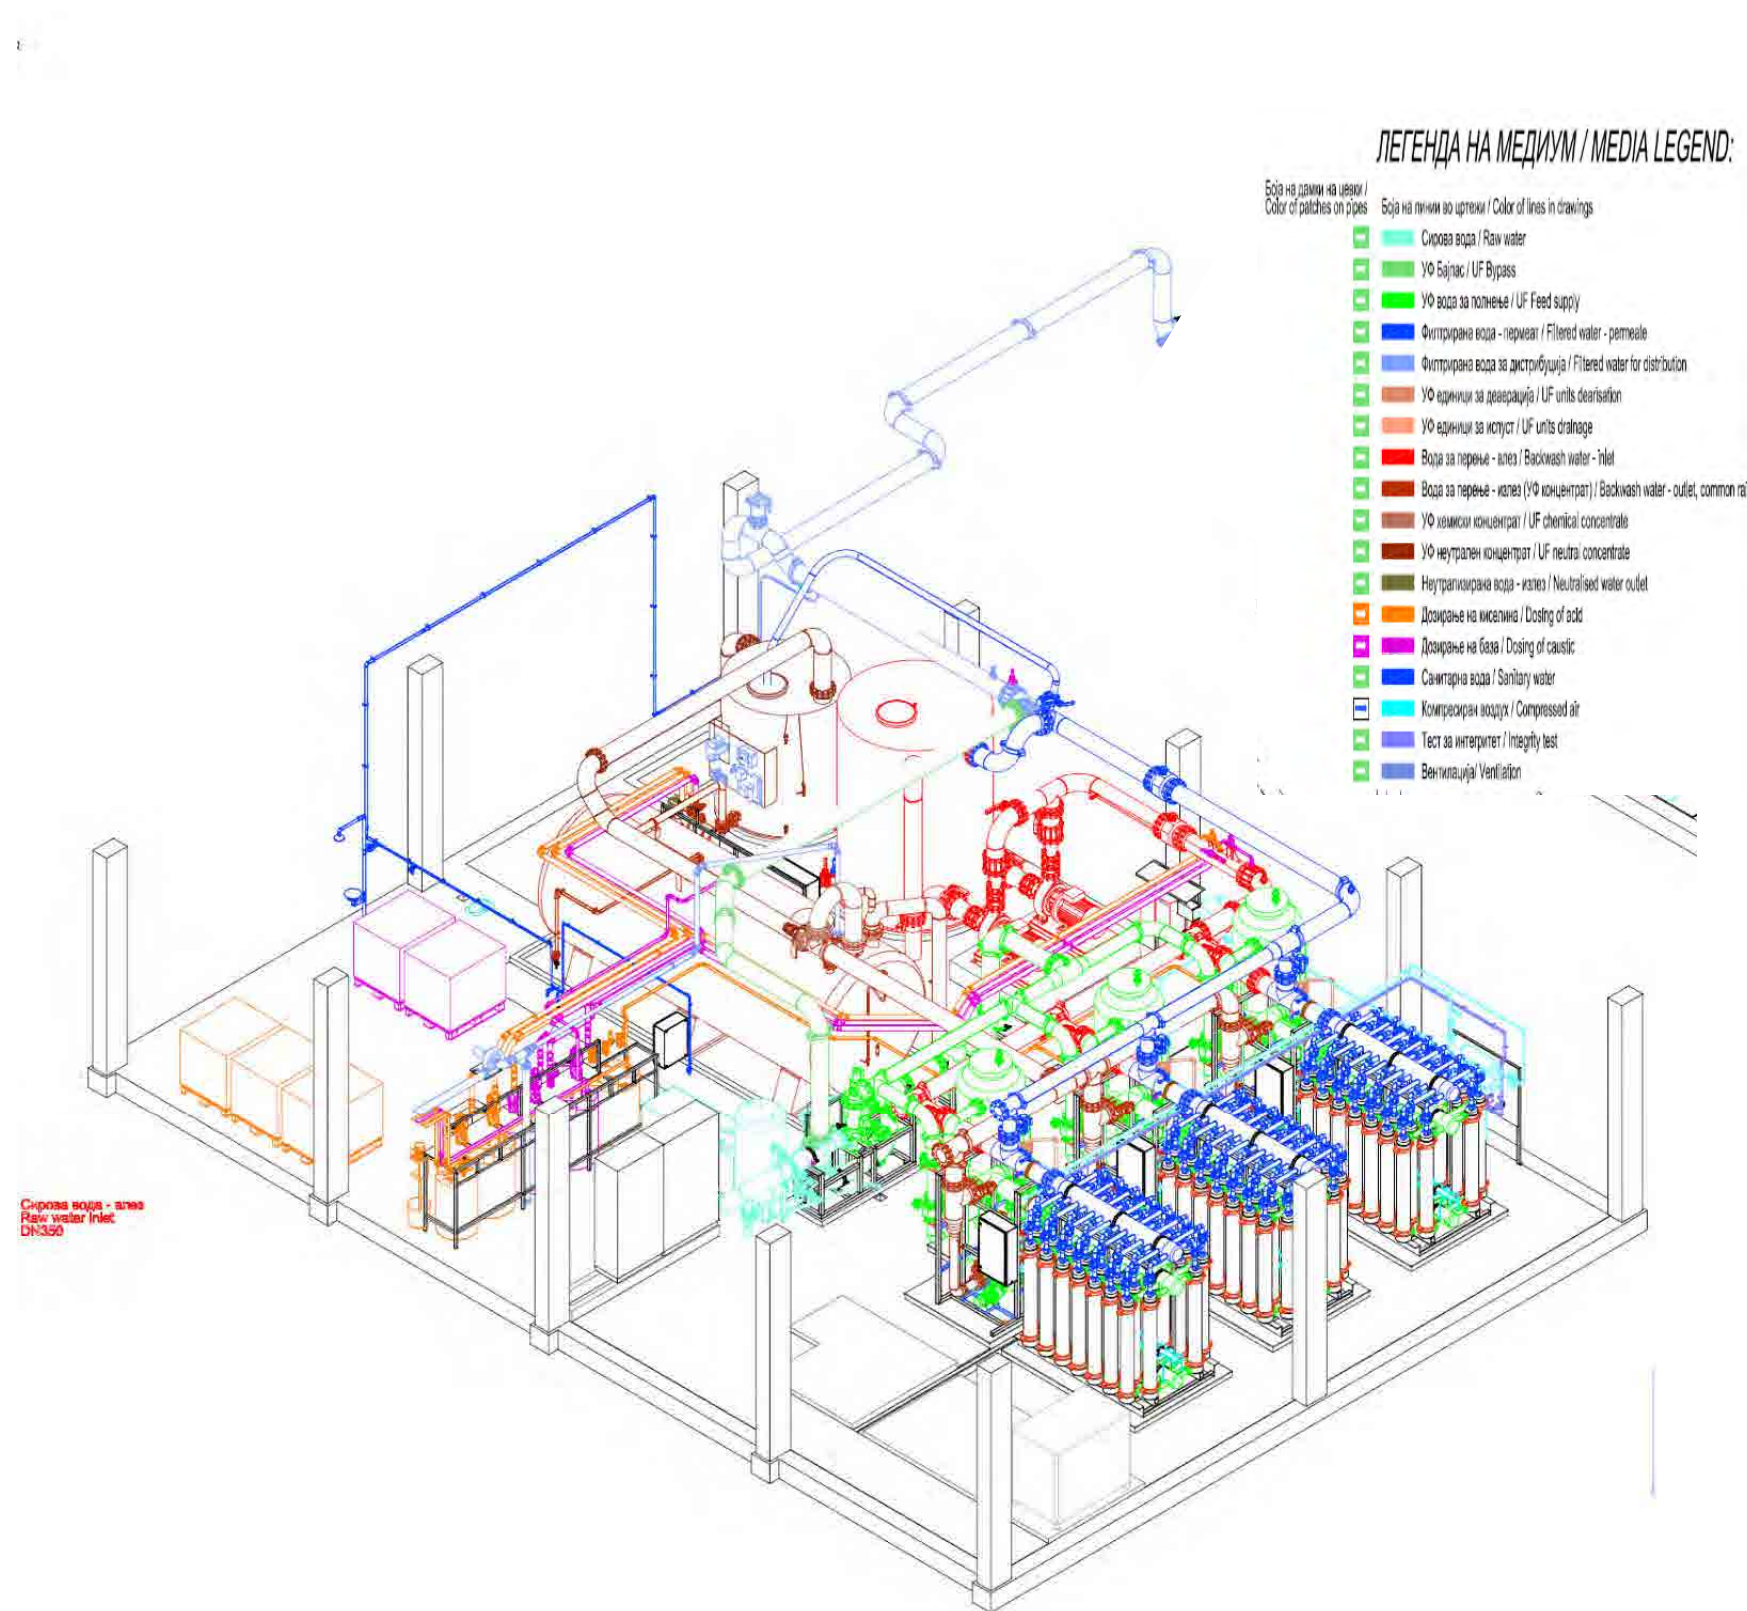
Plan and Cross Section of Newly Constructed Probistip WTP
